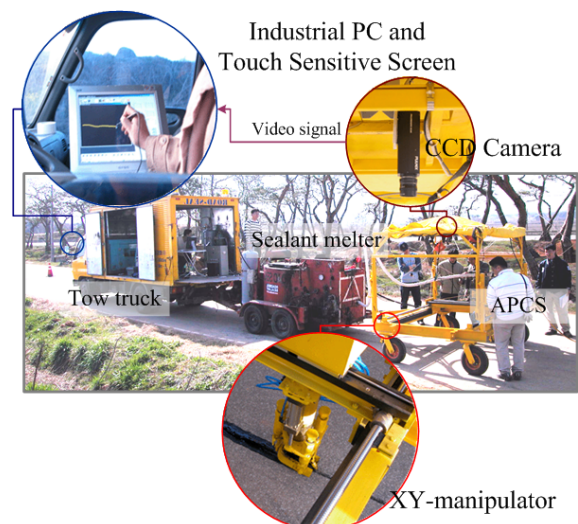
Automated Pavement Crack Sealer(APCS)
